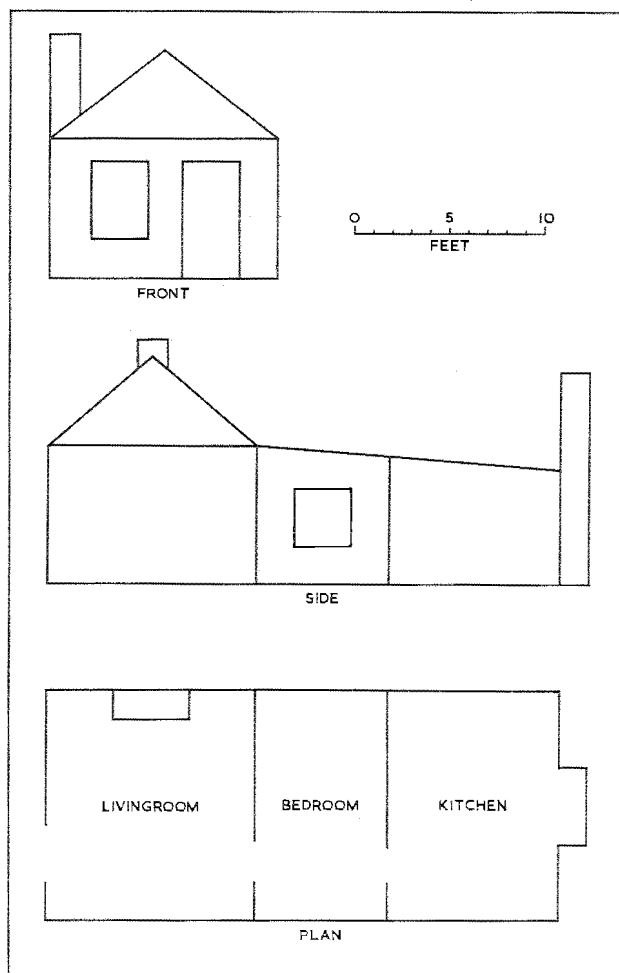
One of the smaller dwellings of colonial Hobart, 283 Murray Street (formerly Veterans' Row). North Hobart. Demolished, with its twin, June 1966.
